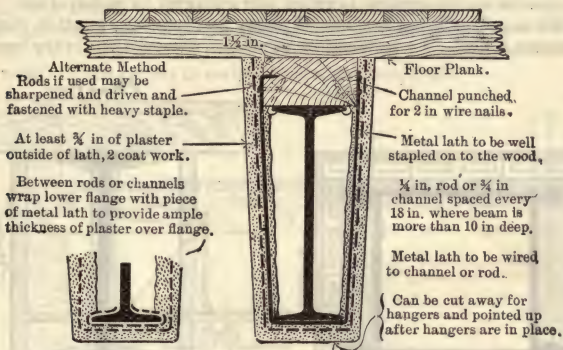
Fireproofing of Steel Beam with Metal-lath and Plaster.
